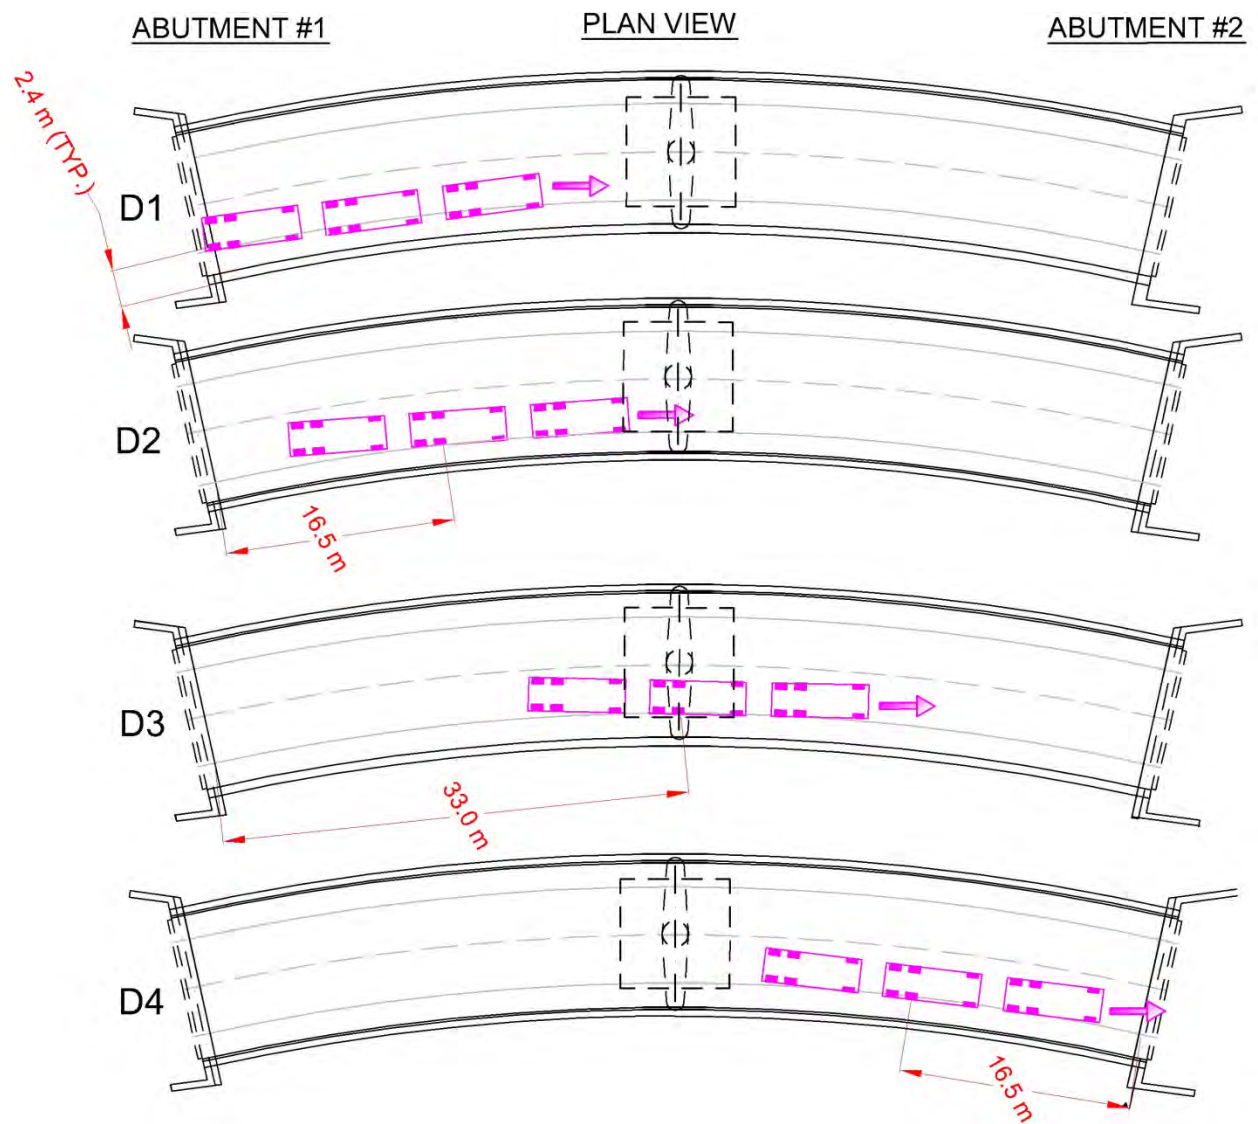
Stockbridge Load Testing Truck Locations (Downstream Lane – Forward)
